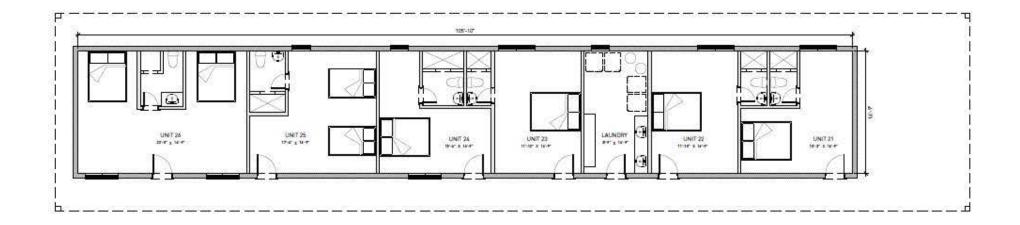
Grandview Courts-Siesta Motel As-Built Plans (Baldridge Architects, 2023): Building B.
